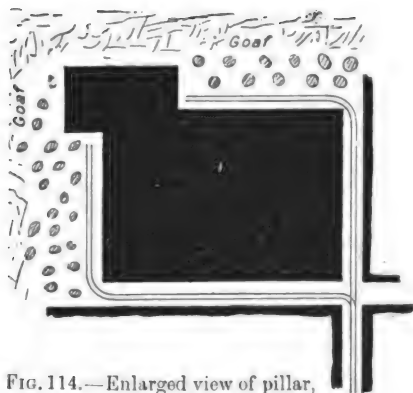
Enlarged view of pillar, showing method of extraction.
